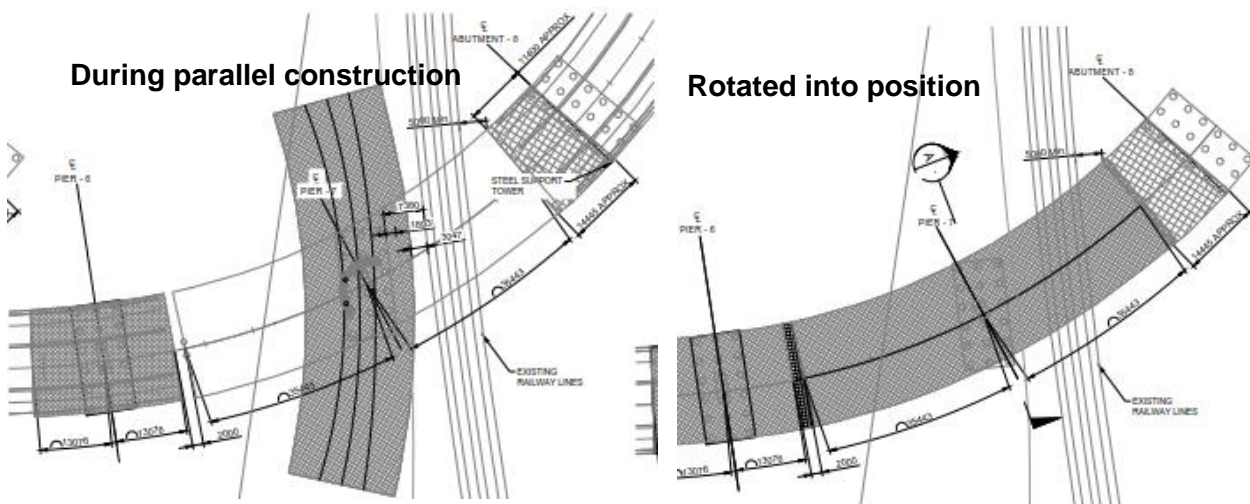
Diagram demonstrating parallel construction of bridge span over the railway
